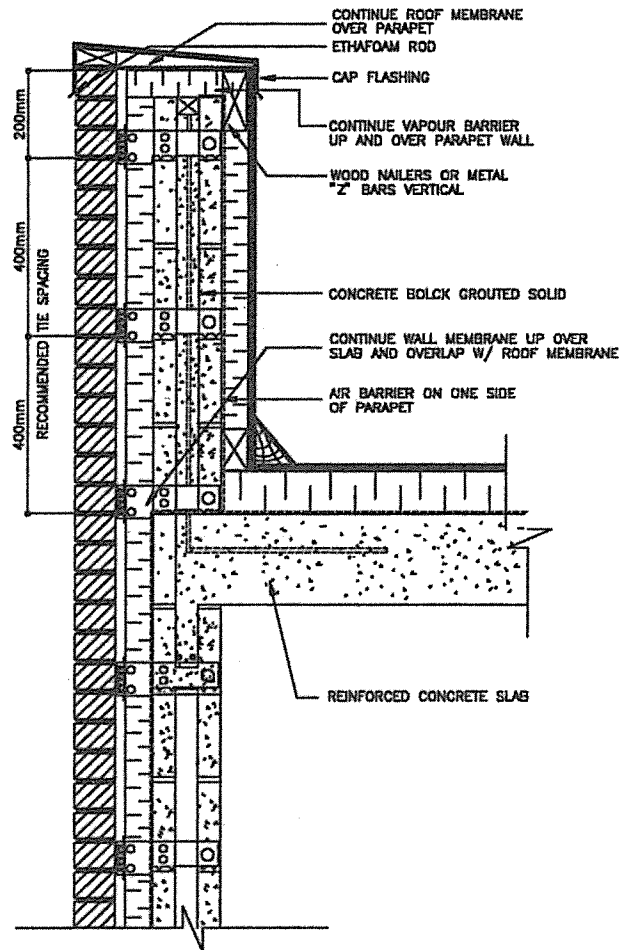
Brick Veneer / Concrete Block Detail at High Parapet
